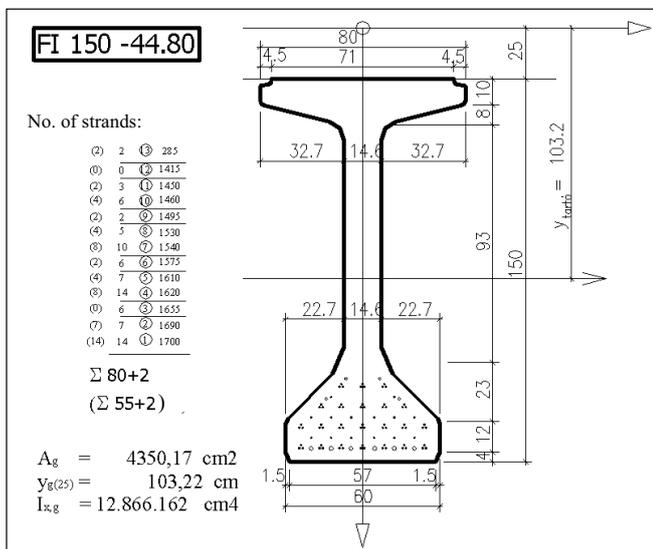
Comparison of the precast bridge girders produced by the Ferrobeton Co.
